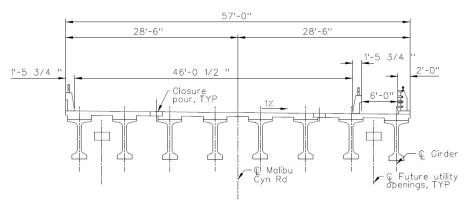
Typical Cross Section of the Proposed Bridge
